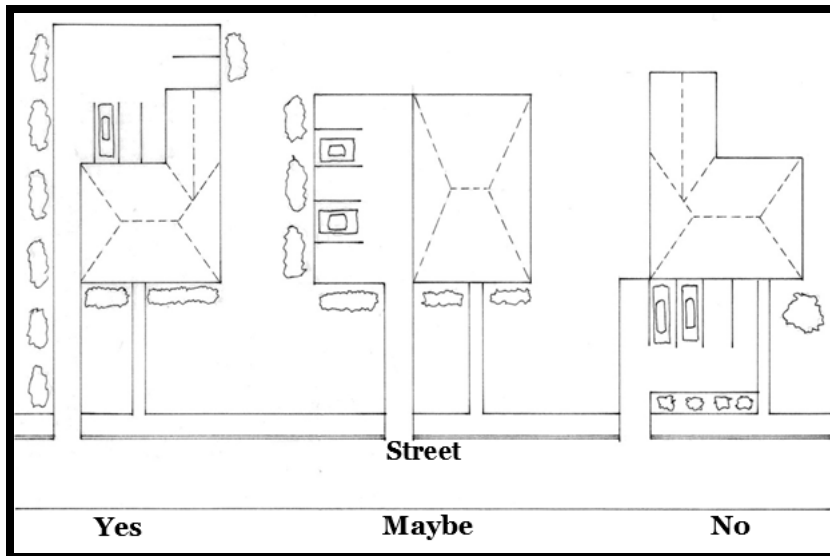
PARKING LOTS ARE NOT PERMITTED IN FRONT YARDS, SHOULD NOT BE SITED IN SIDE YARDS AND MAY BE PERMITTED IN BACK YARDS.
